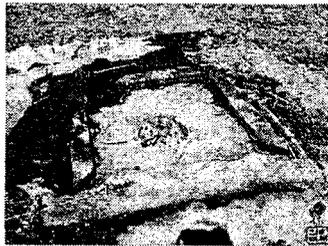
Redwood strips surrounding the inlet/outlet structure at bottom of pond
